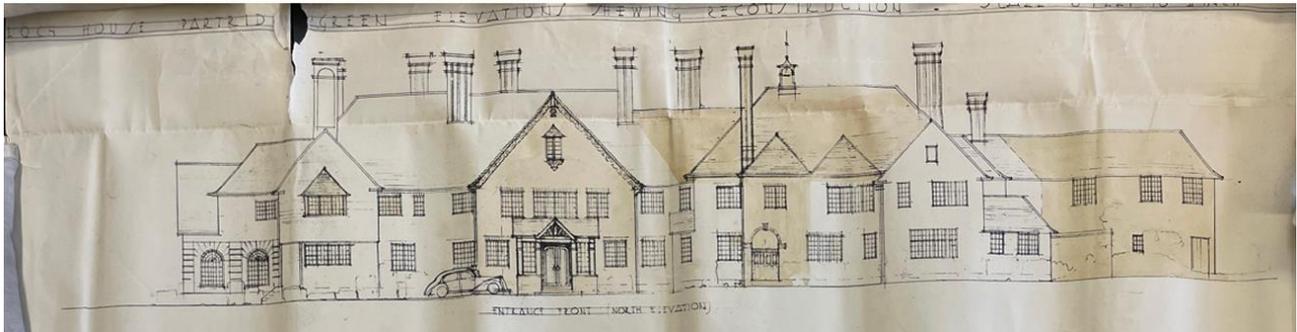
Maple & Co elevations of 1938 showing new and reconstructed work with a pale yellow wash (original to the drawings).
